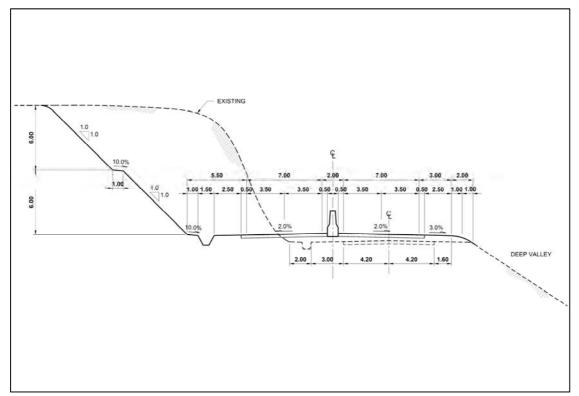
TYPICAL CROSS SECTION: AT MOUNTAINOUS SECTION
